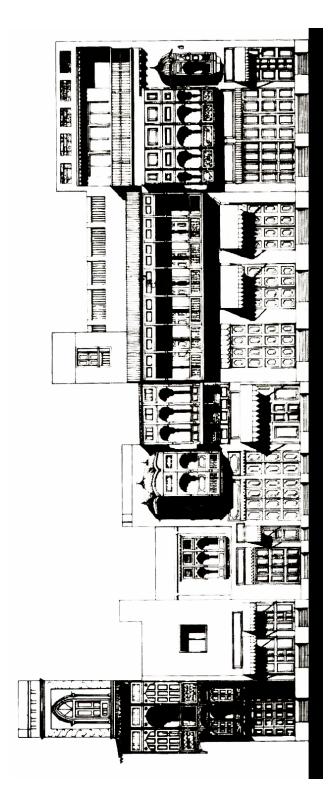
"Cheek by Jowl" dwellings of Walled City of Lahore. The houses have no space between them and are constructed flushed to each other. (Source: The Walled City of Lahore, publication by PEPAC)
